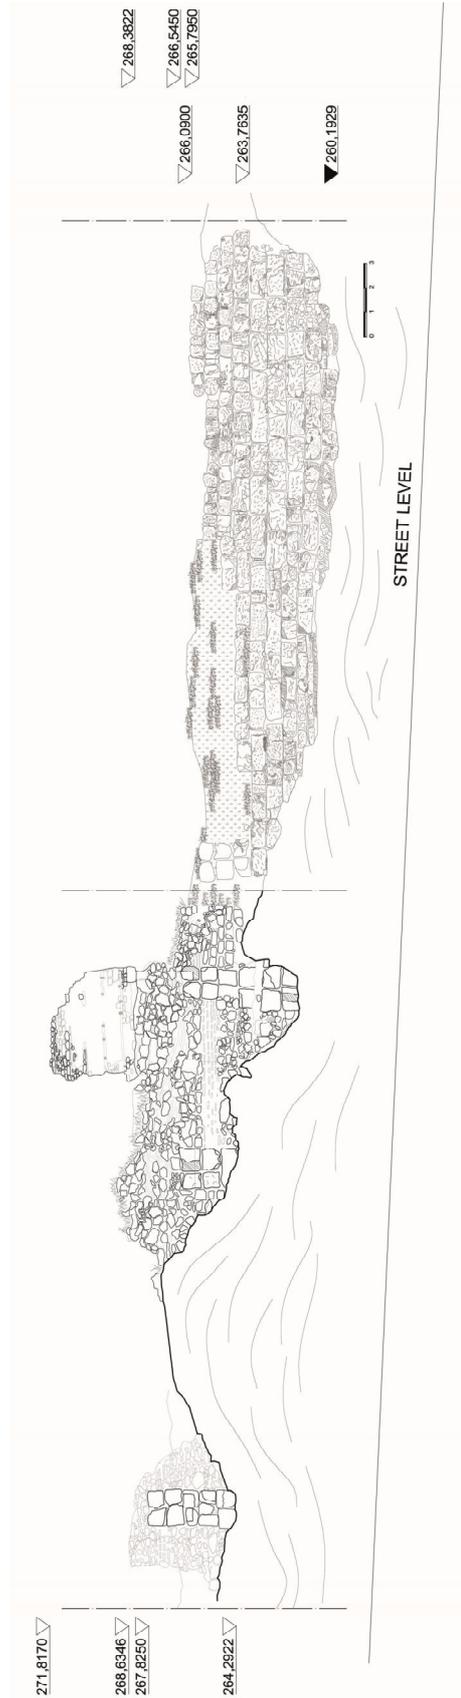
Terrace walls, W1.2, W1.1, WP1, WP2, image by author (2013).
